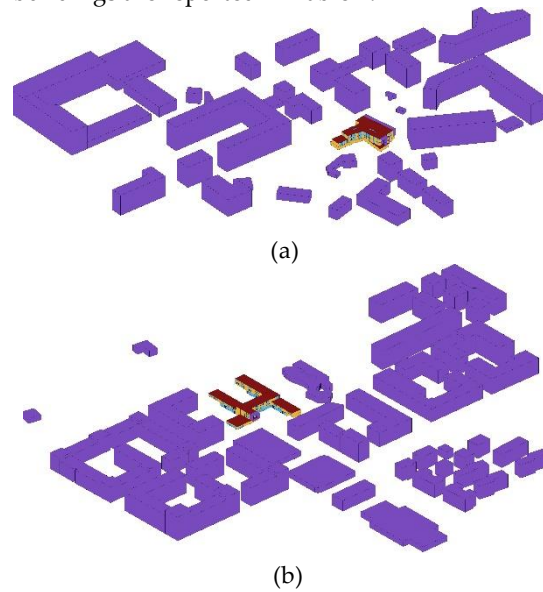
3D geometrical models of the buildings with context: (a) Positano kindergarten and (b) Langer primary school
